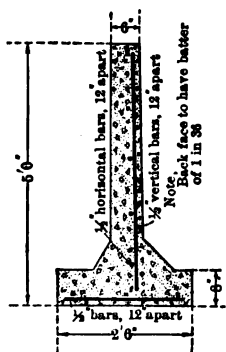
Reinforced-concrete Retaining-wall, 5 ft High
